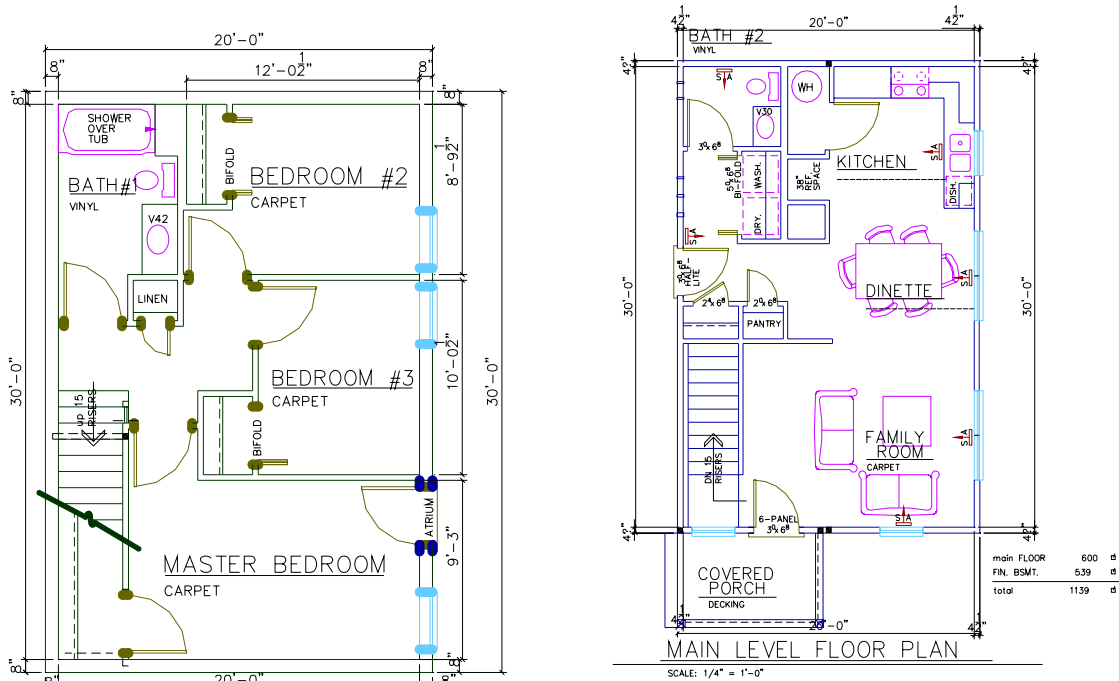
ZEH4 floor plan. Bedrooms on first floor (left); living areas on second floor.
